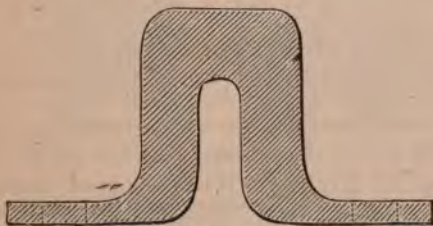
LIGHT BRIDGE RAIL, Full-sized Section.
